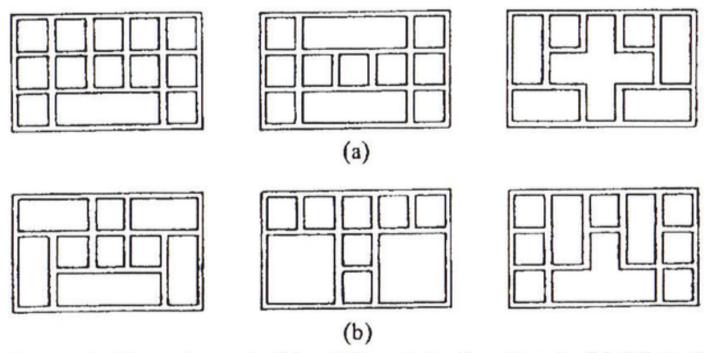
Plans shown in (a) satisfy proviso 2; plans in (b) fail to do so.
